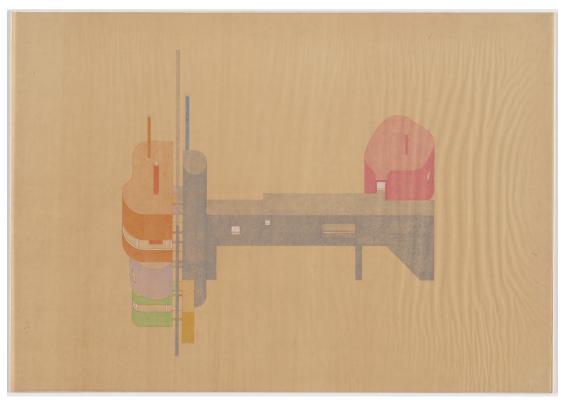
Wall House 2 (A. E. Bye House) Project, Ridgefield, Connecticut, Isometric, John Hejduk, 1973.
